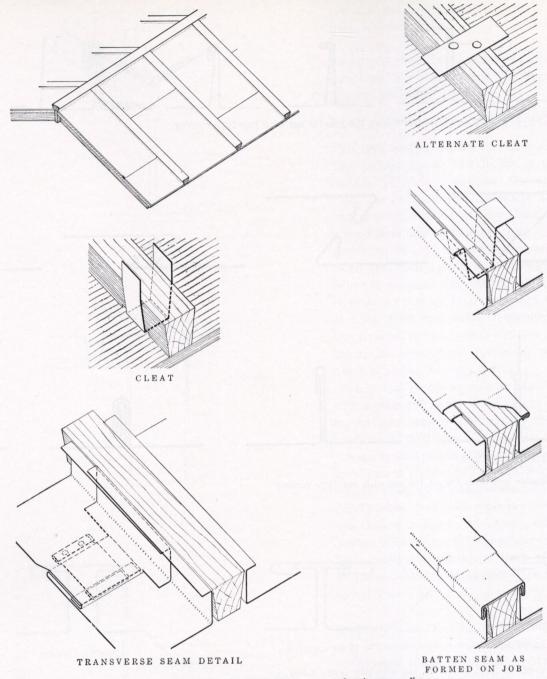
Ribbed-seam roofing details for use with pan type aluminum roofing.
